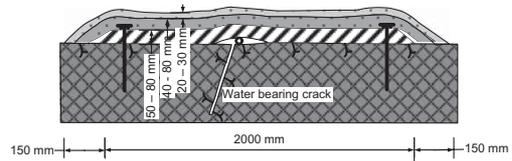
The Swedish drain consists of a perforated plastic tube at the water bearing crack, which is covered by an insulating sheet with closed pores. The sheet is fixed to the rock by short bolts and reinforcement bars. The sheet is covered with steel fibre reinforced shotcrete which bonds to the rock surface at the edges. Finally the steel fibre reinforced shotcrete is covered by unreinforced shotcrete.
